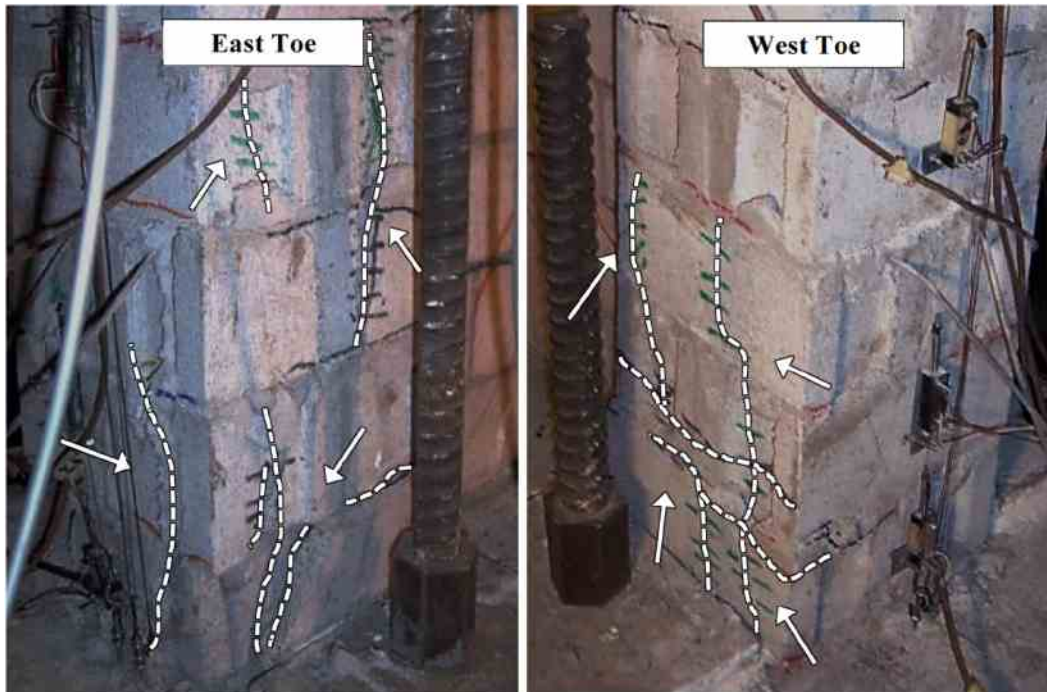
Appearance of Vertical Cracking in Wall 7 ($\Delta\epsilon = \pm 2.63\%$)
